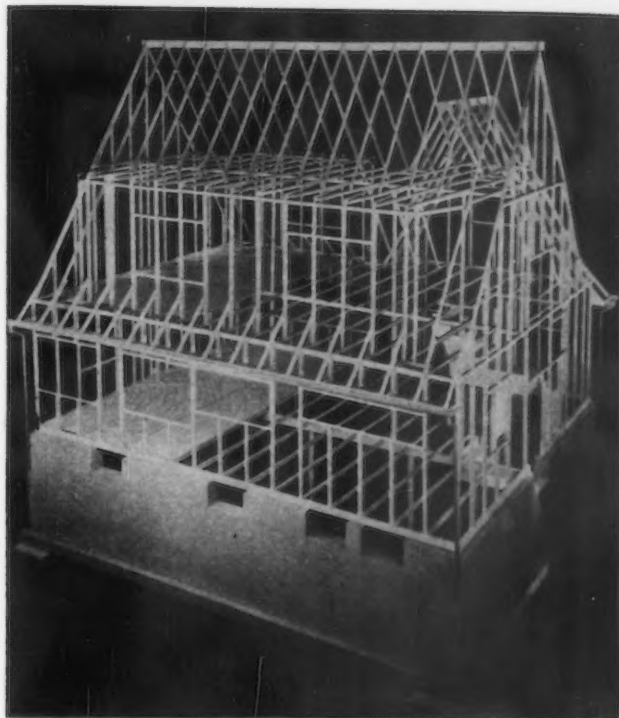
Steel frame and corrugated flooring base, as developed by the Scullin Steel Co., St. Louis. This illustration is from a model.
